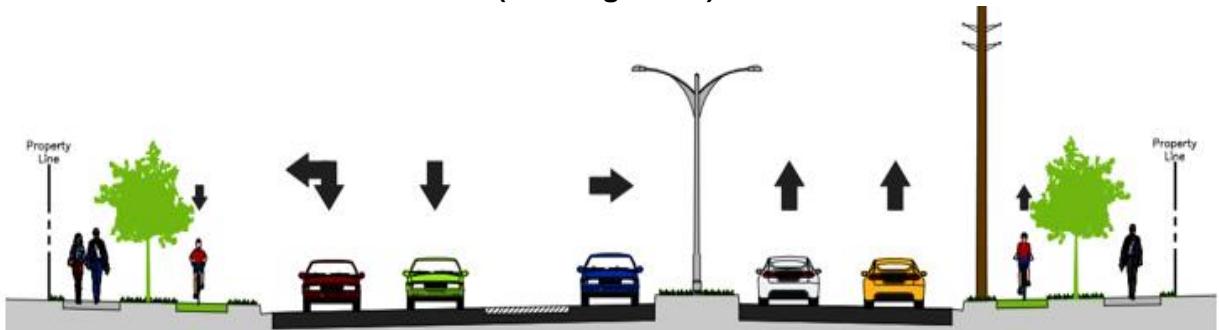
Preferred Richmond Street Cross-Section, North of Fanshawe Park Road (Looking North)
